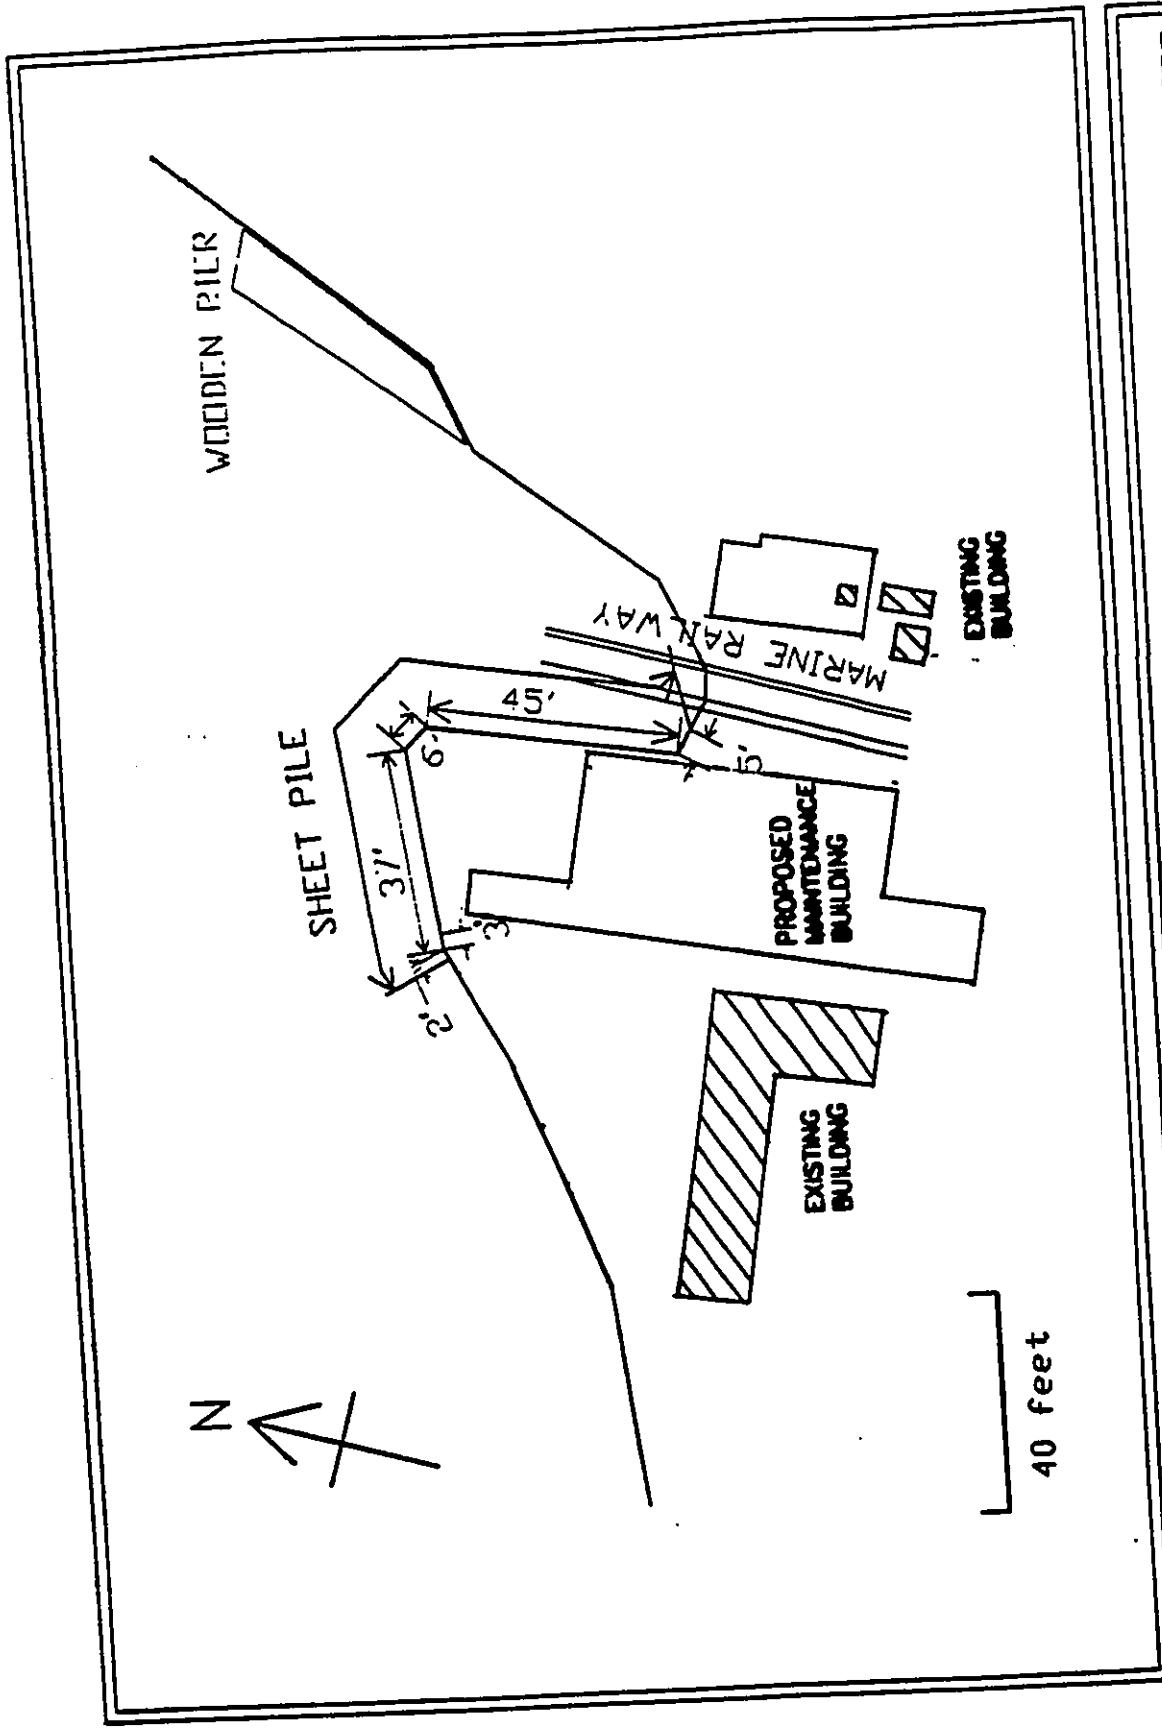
CONCEPTUAL PLAN FOR SEAWALL DESIGN AT MAINTENANCE BUILDING SITE
